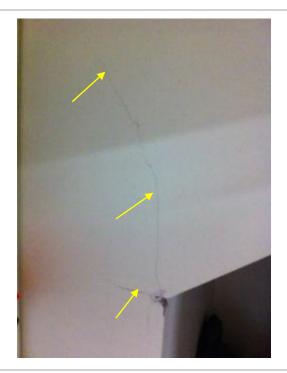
Diagonal Cracking at Stair Re-Entrant Corner in First aid Room
